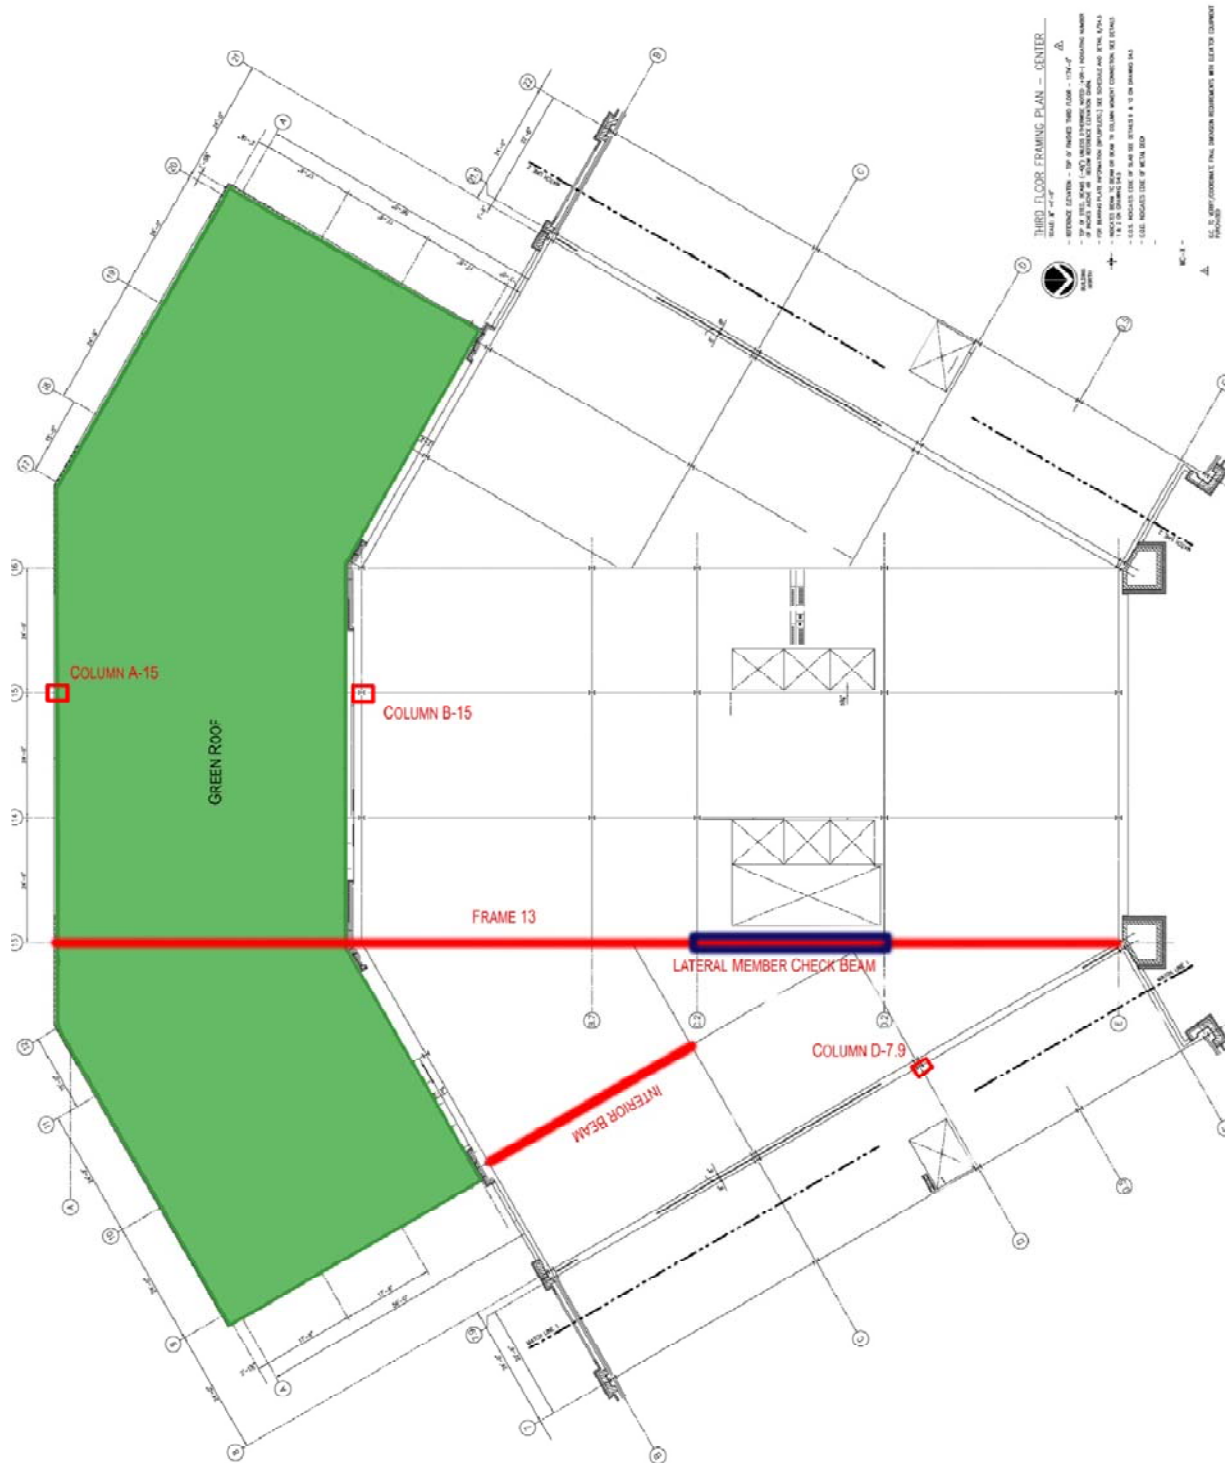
Third Floor Center of Redesigned Concrete Building with Portal Analysis Frame Indicated and Columns for Column Checks Indicated
